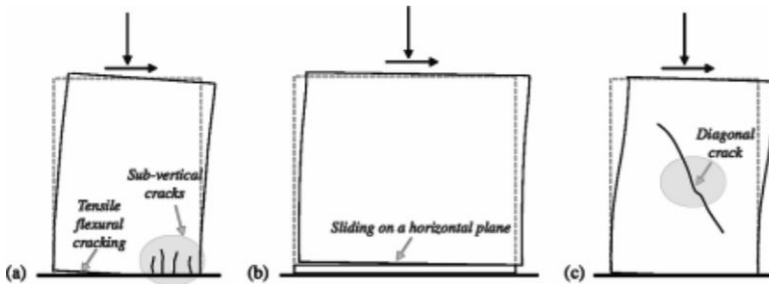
Typical failure modes of masonry piers due to horizontal loads: (a) rocking; (b) sliding shear failure; and (c) diagonal cracking [17]
